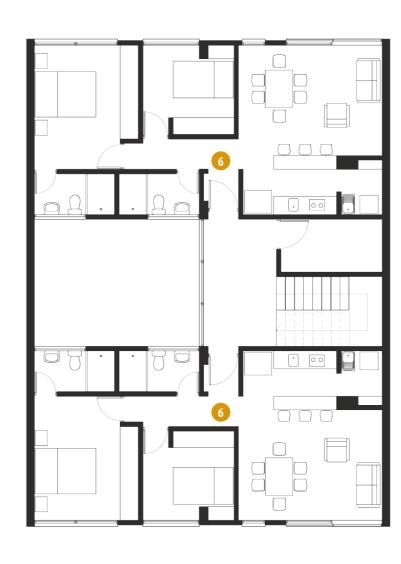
TYPOLOGY B\_FIRST FLOOR PLAN
